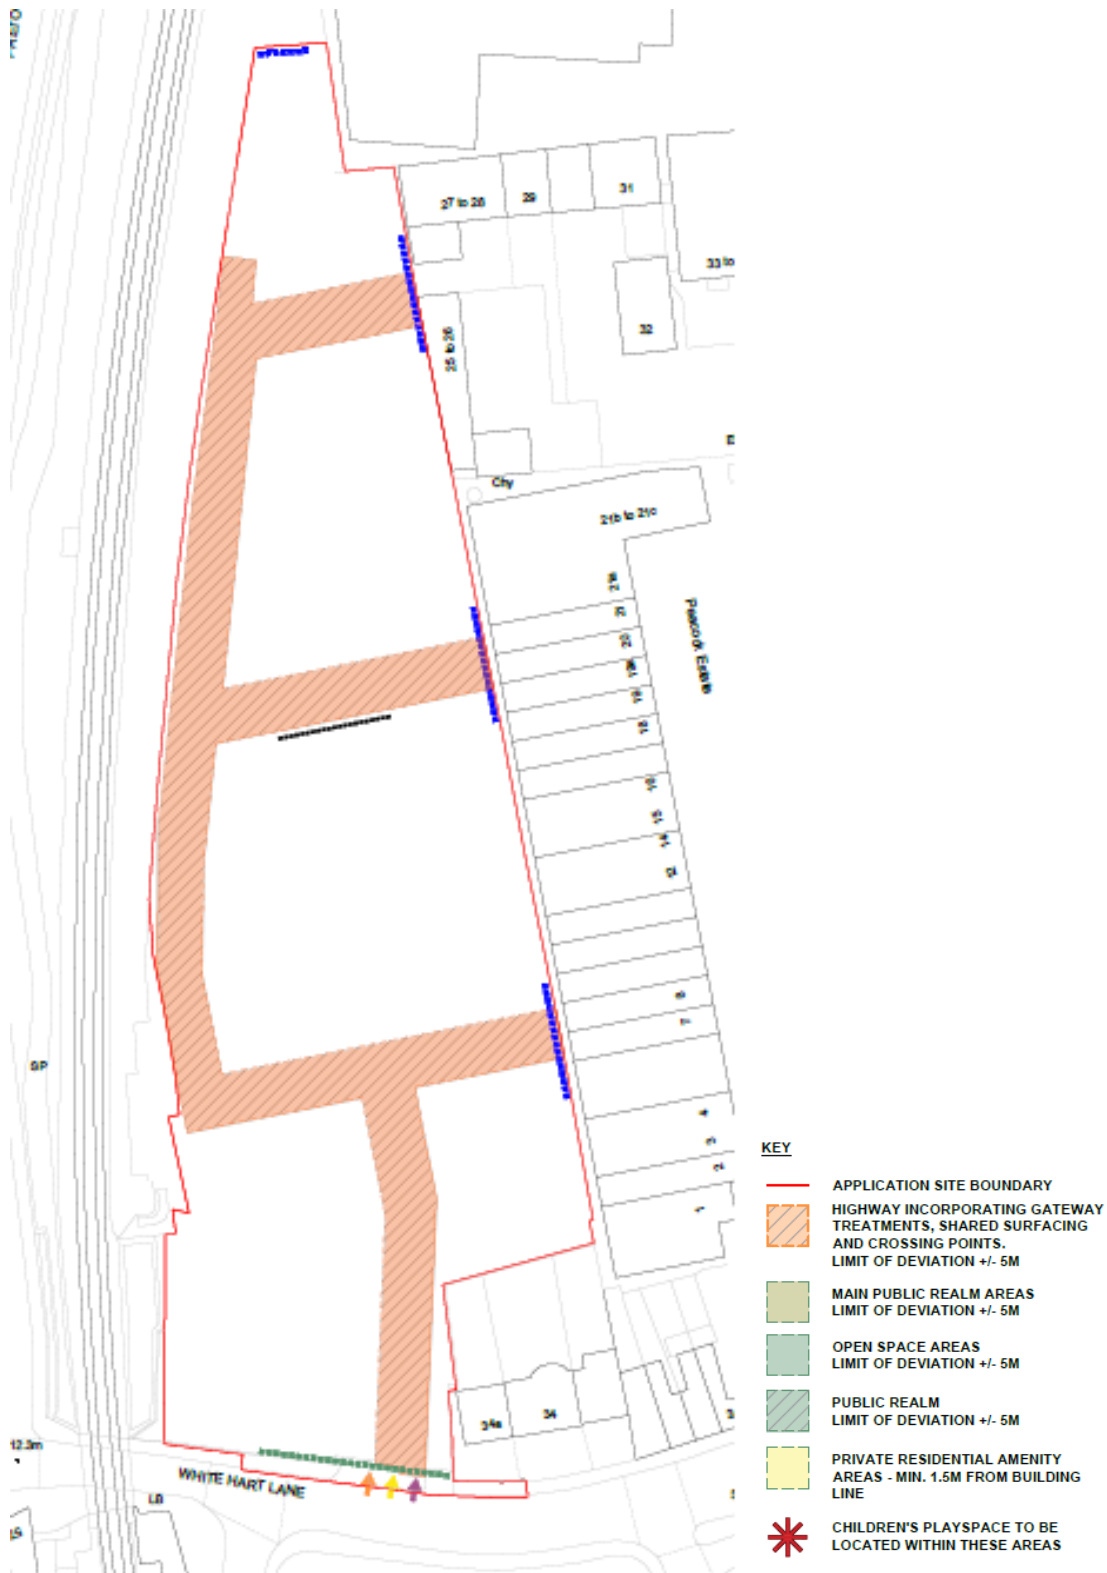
Parameter Plot Plan – Site Access (Source: Applicant)
